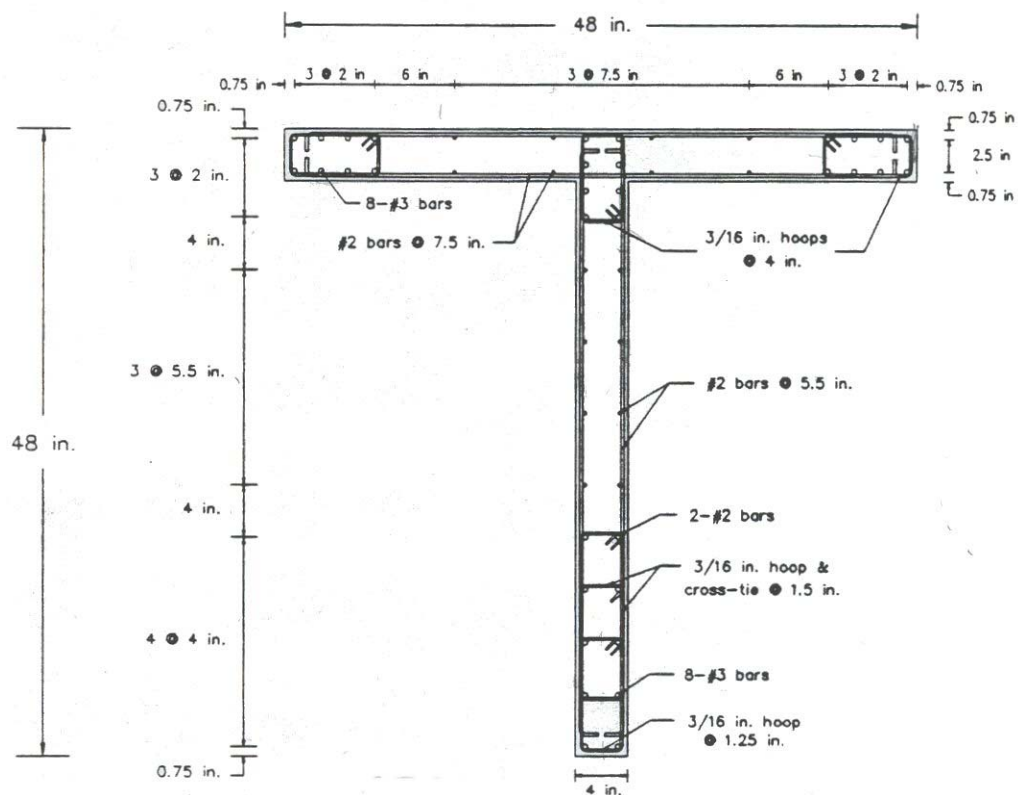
Wall Section TW1 Tested by Thomsen and Wallace [1995]
